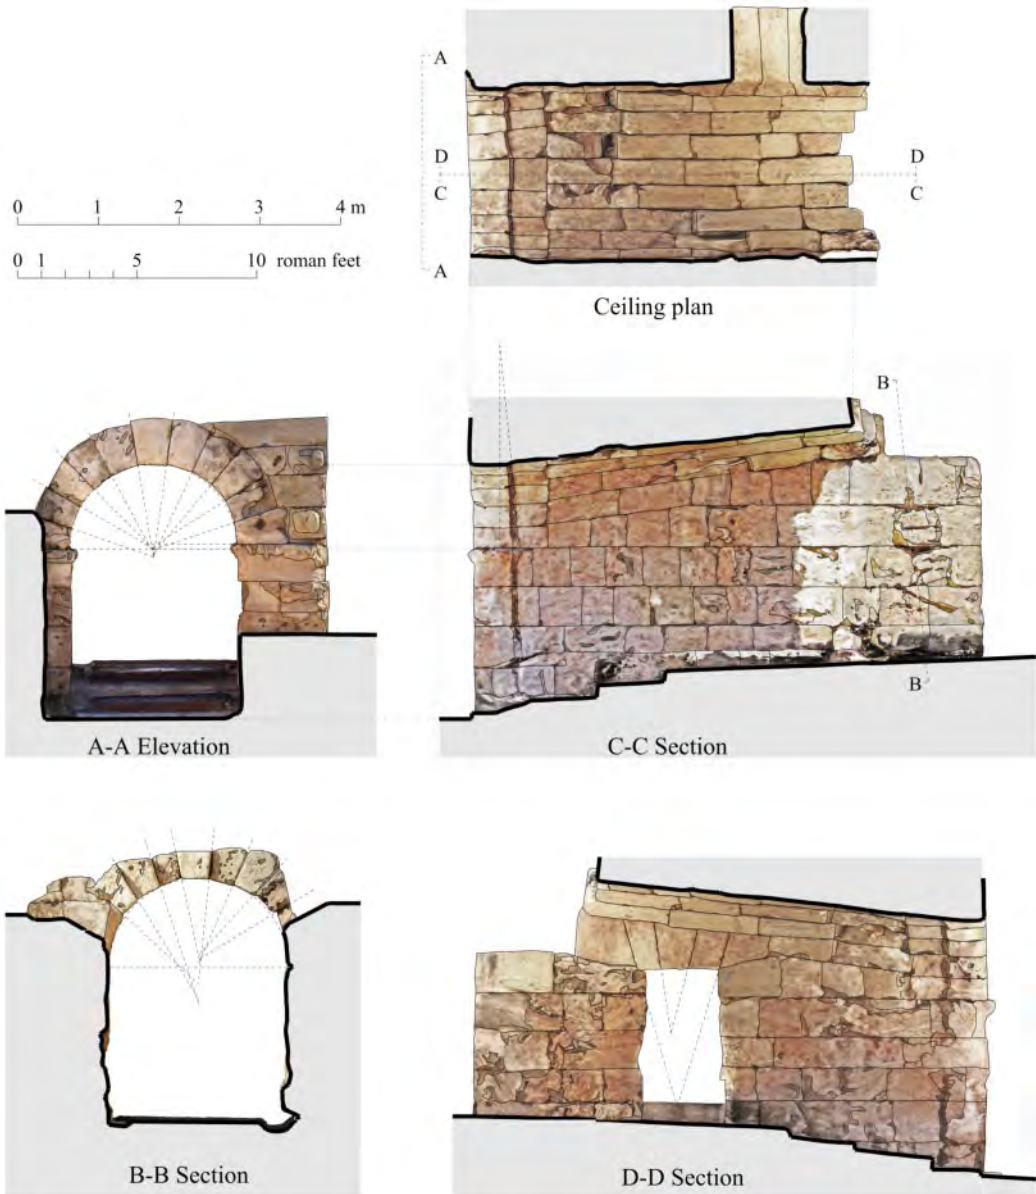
Plan, elevation and sections of the aditus maximus (image: authors).
